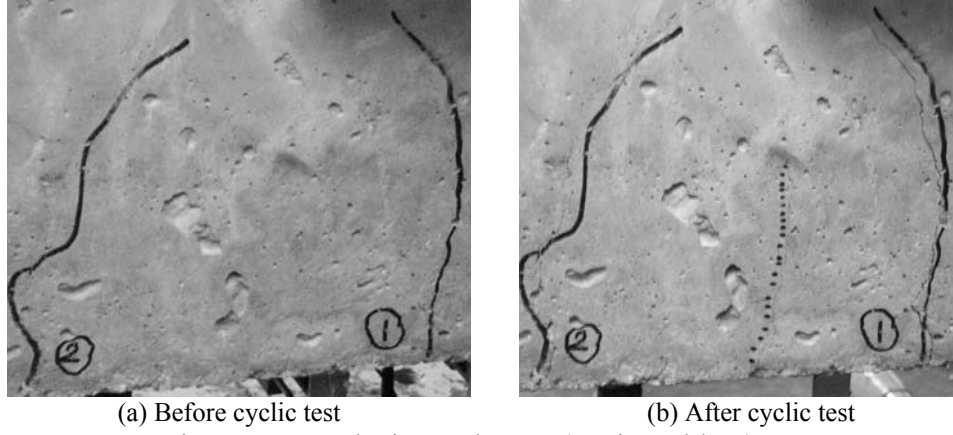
Cracks in RC beam: (B3 in Table 3).
